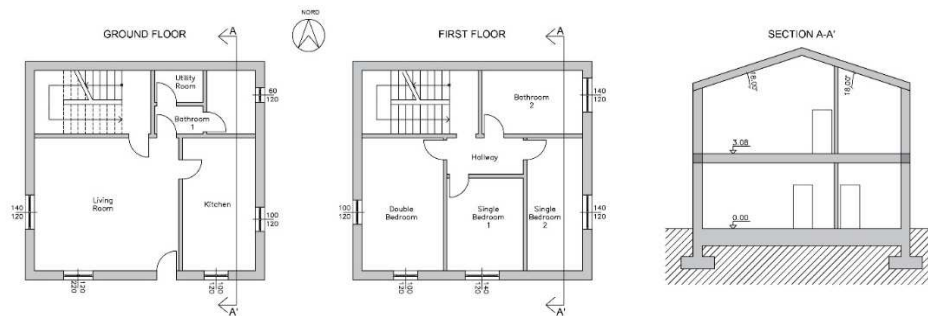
Plan view of the ground floor, first floor and section of the building model.
